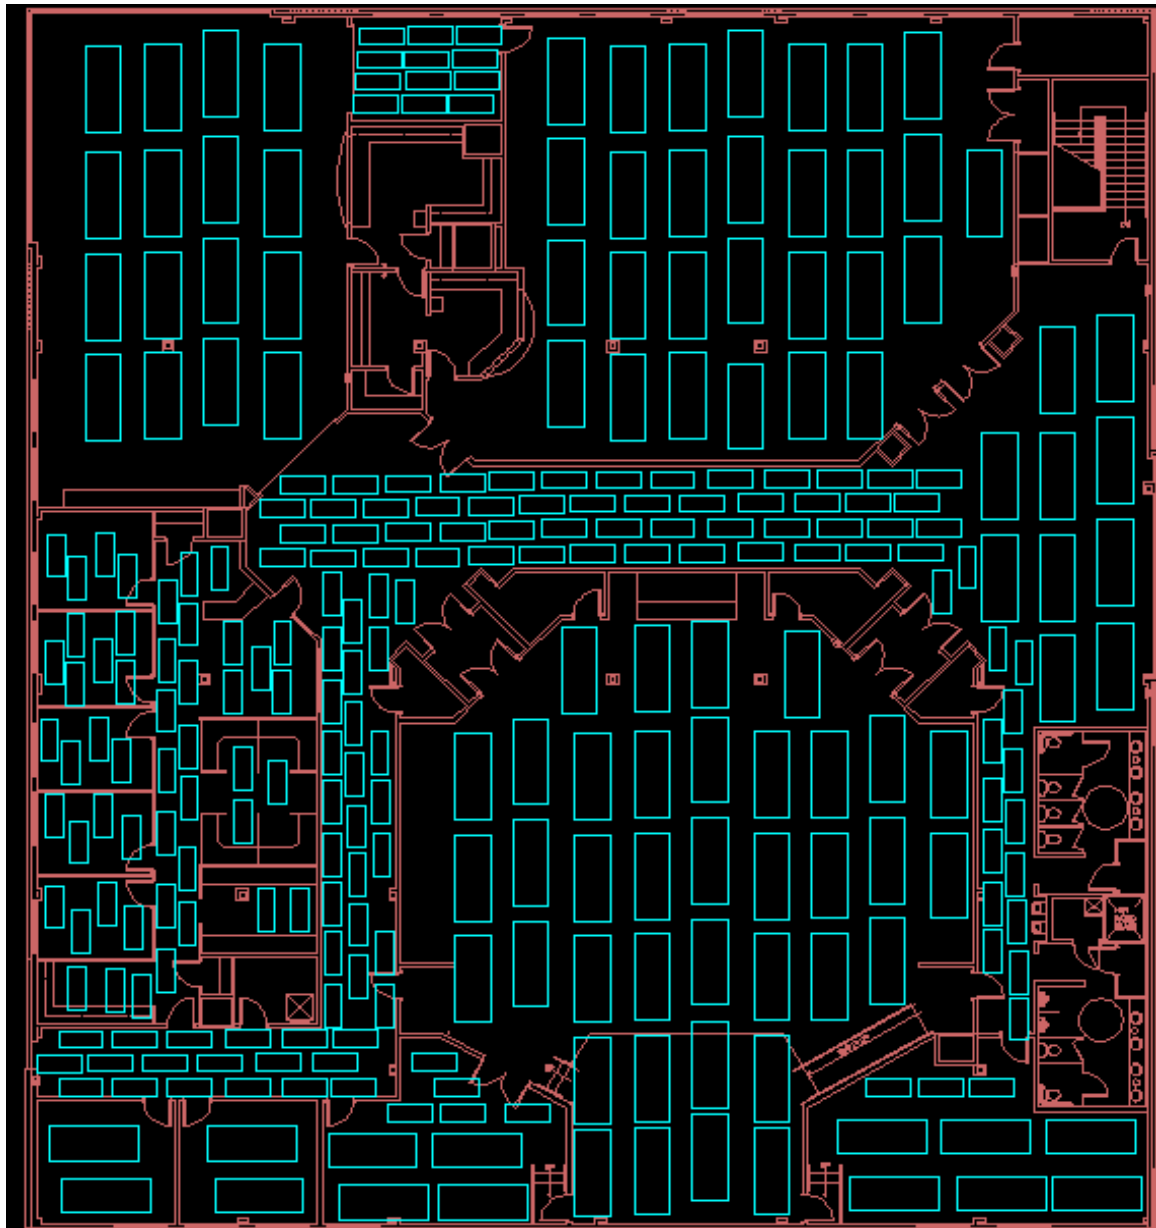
Reflected Ceiling Plan of Proposed Ceiling
